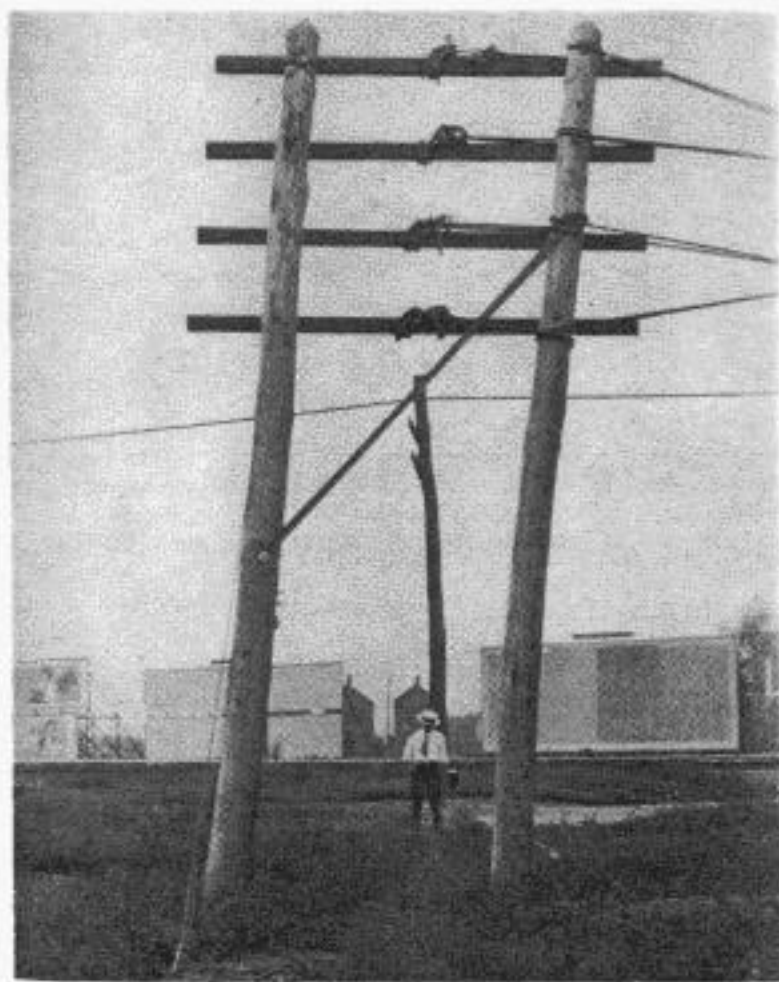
Test "H" fixture under 7900-lb. load just before $\frac{5}{8}$ -in. bolt at lower end of braces sheared
